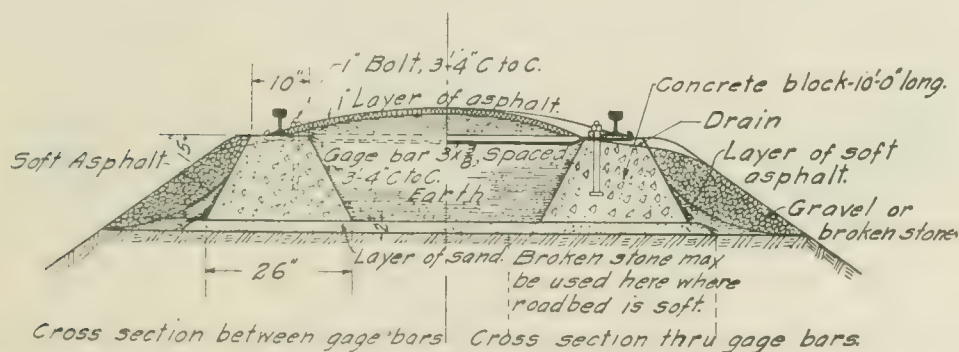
DESIGN FOR A PERMANENT WAY FOR STEAM RAILWAYS, SUGGESTED IN "ENGINEERING NEWS," JAN. 5, 1899.
